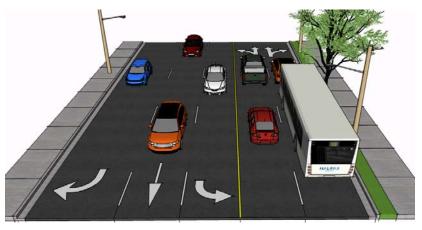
Young Street Cross Section (Kempt to Robie, looking West)
